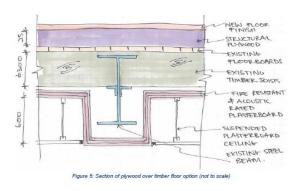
Plywood over existing floor—structural detail option 1. (Source: Floor Options Study, Taylor Thomson Whitting Pty Ltd, 2018)
